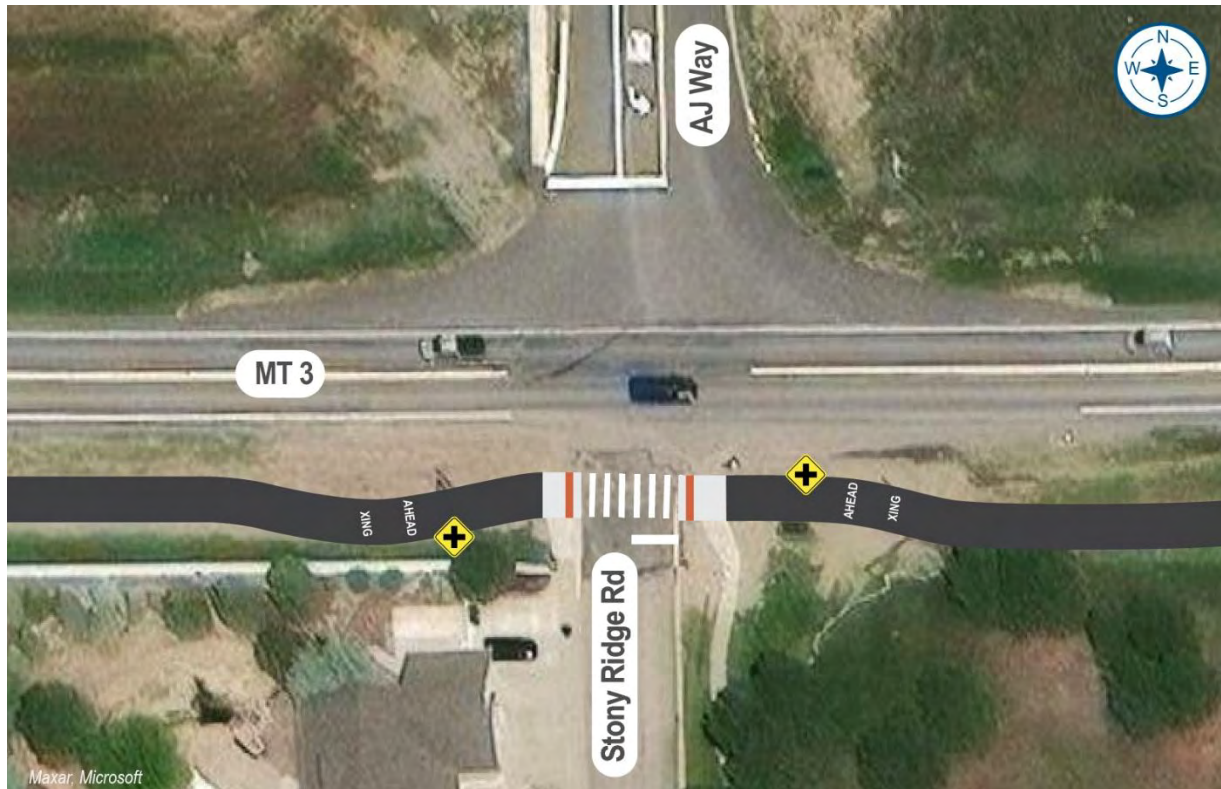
Existing Signage and Pavement Markings at Skyline Trail Crossings
